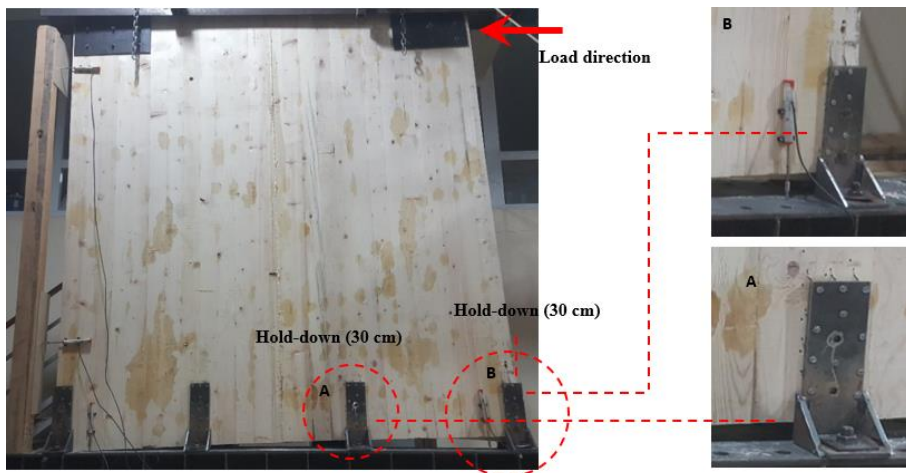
CLT wall to foundation Detail-2 and deformation of connections
